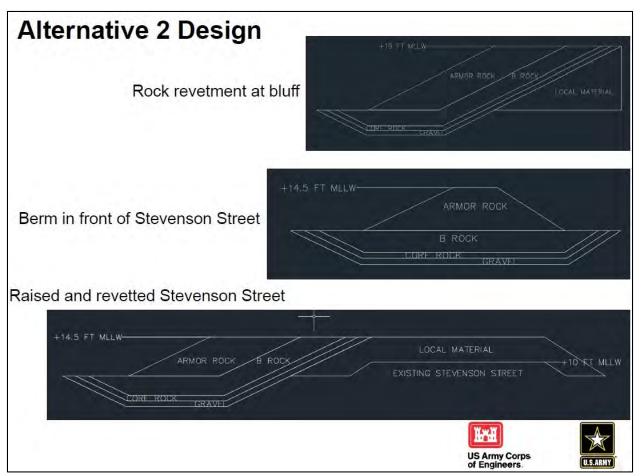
Conceptual design for the proposed revetment, berm, and raised and revetted Stevenson Street for the Barrow coastal storm damage reduction.
